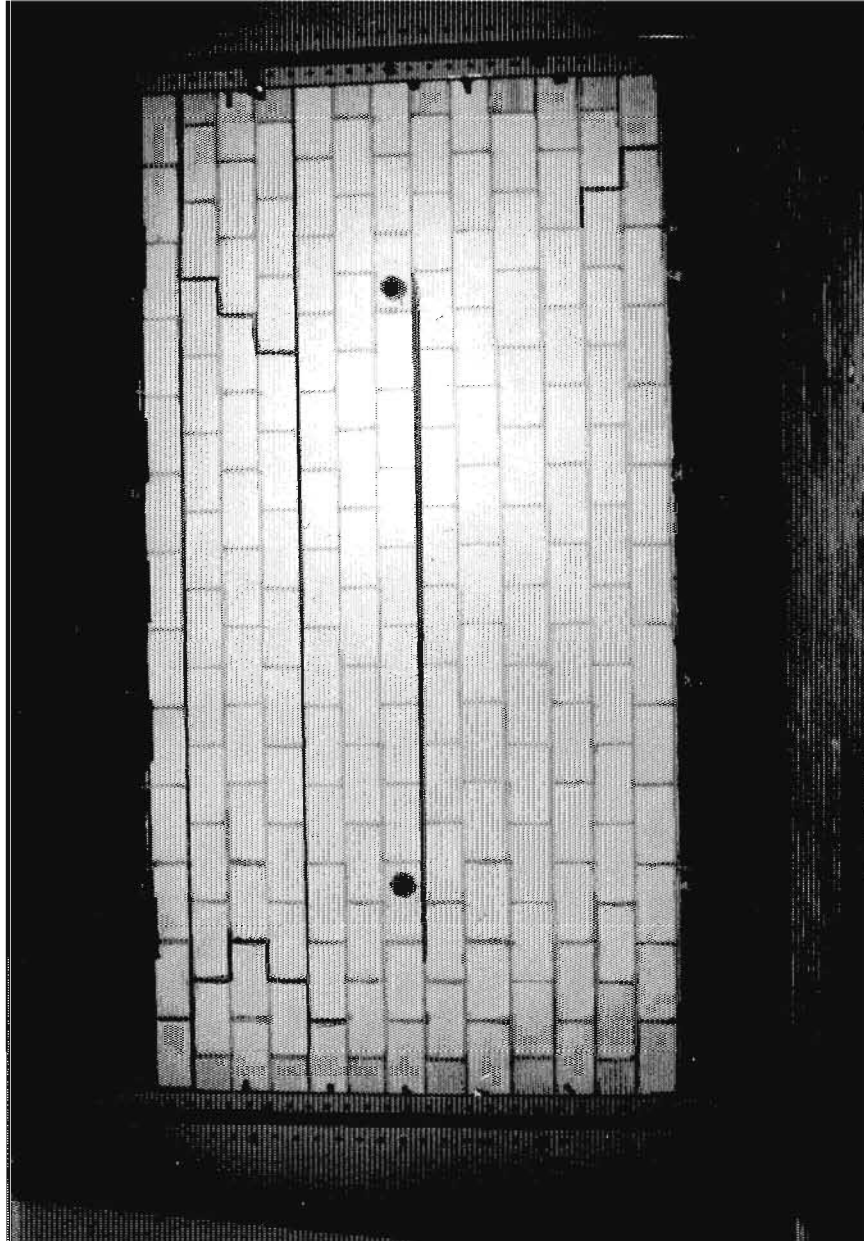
CRACK PATTERN AT FAILURE – WALL5
